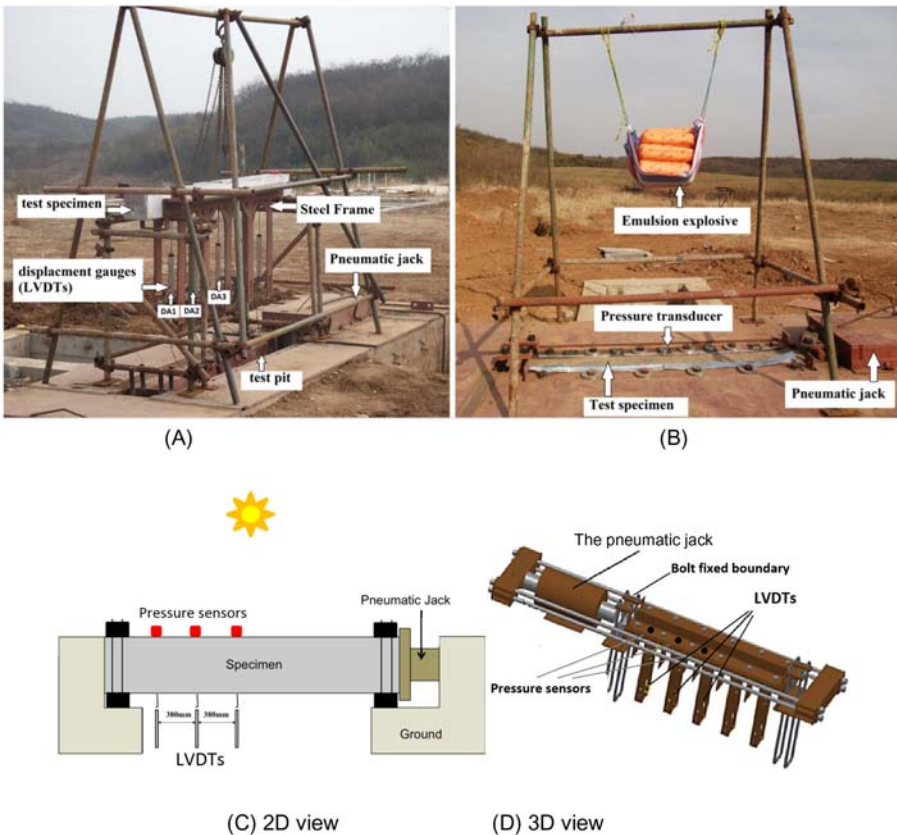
Blast test setup (A) before, (B) after the specimen being installed into the test pit, (C) 2D view of test, and (D) 3D view of the test.
